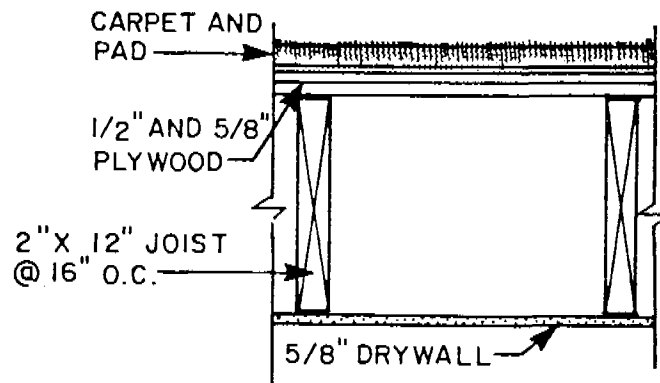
Wood-Frame Floor for Residential Building⁽³⁾
